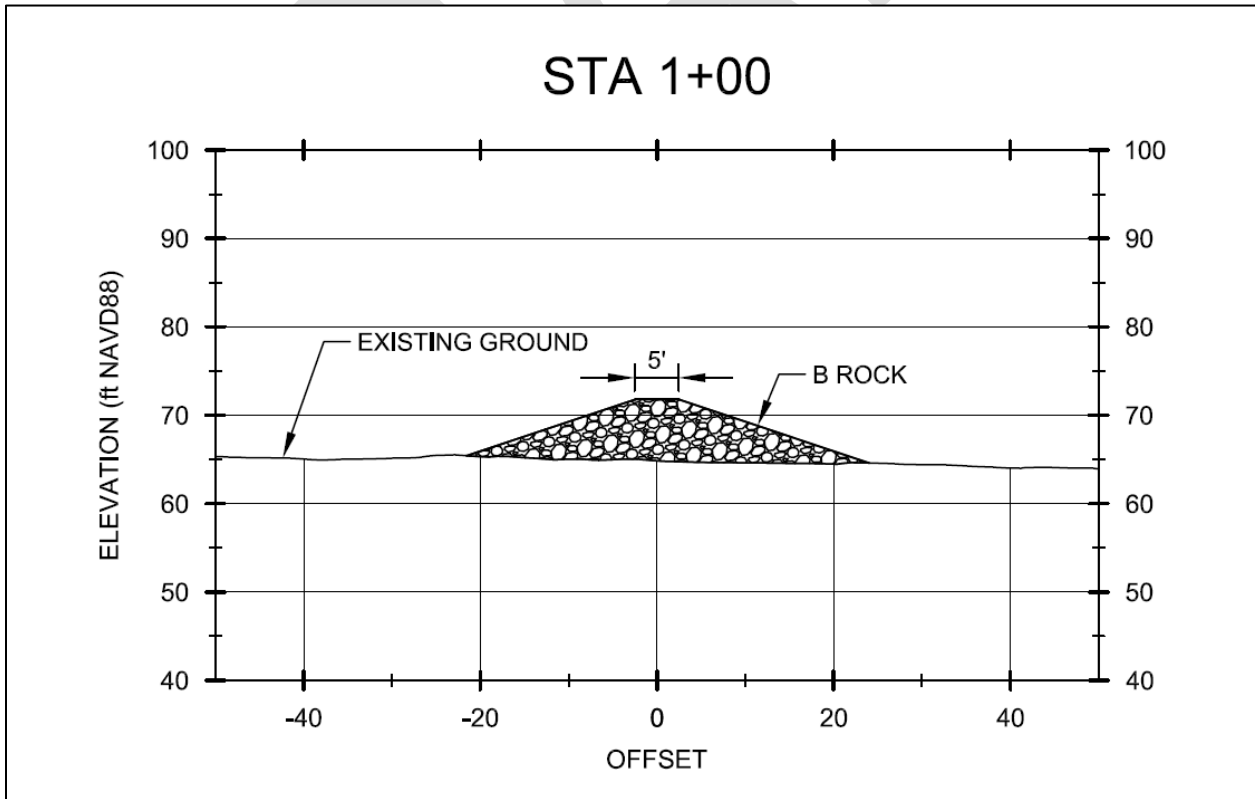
450-foot-long berm cross section for Alternative B-3.
